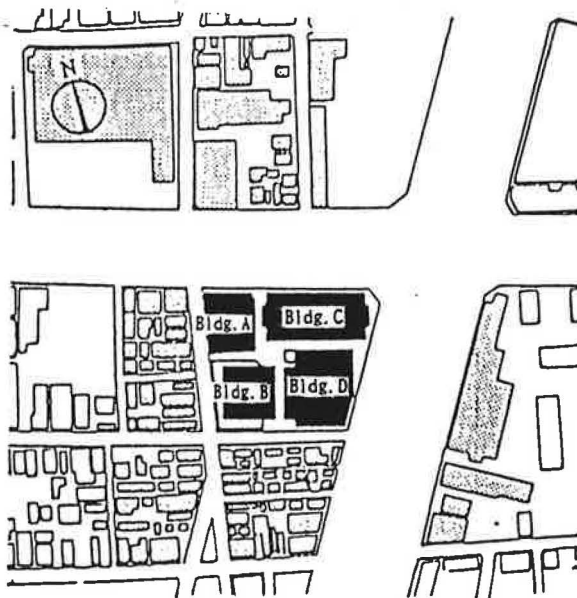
Building complex under construction and its surroundings (Kawasaki, Japan).
